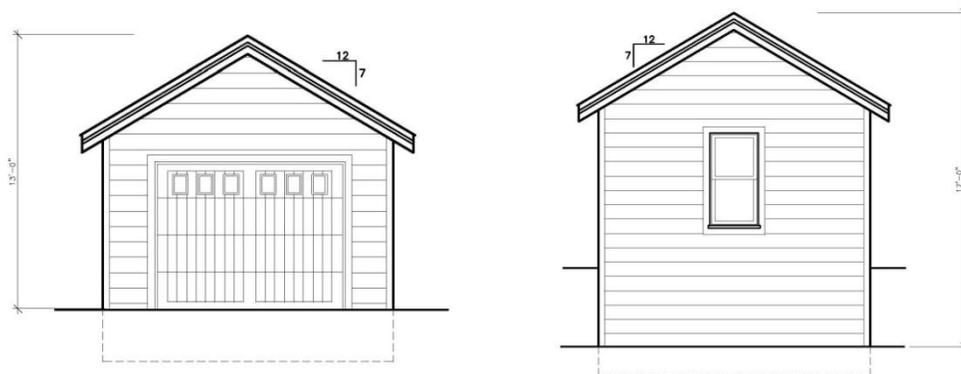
Proposed west elevation (left, facing 6th St.) and east elevation (right, interior lot)
